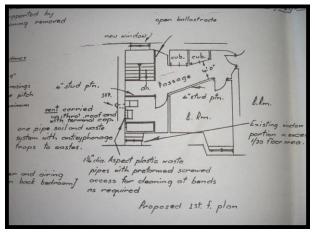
Drawing *c*.1955 showing the proposed subdivision of the first-floor rooms.
